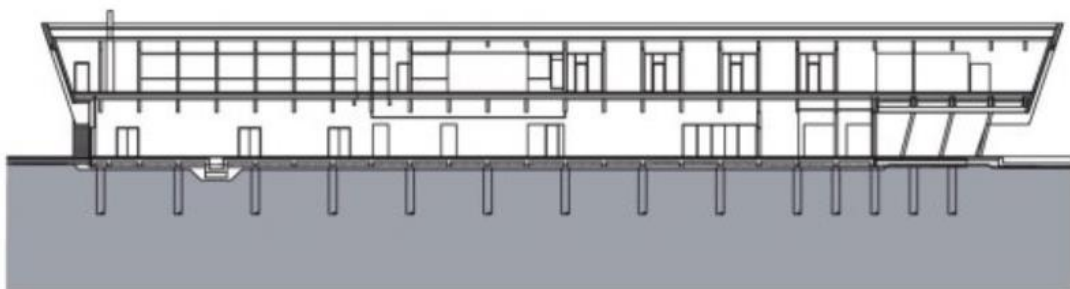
UCEEB DEMO BUILDING CROSS-SECTION
